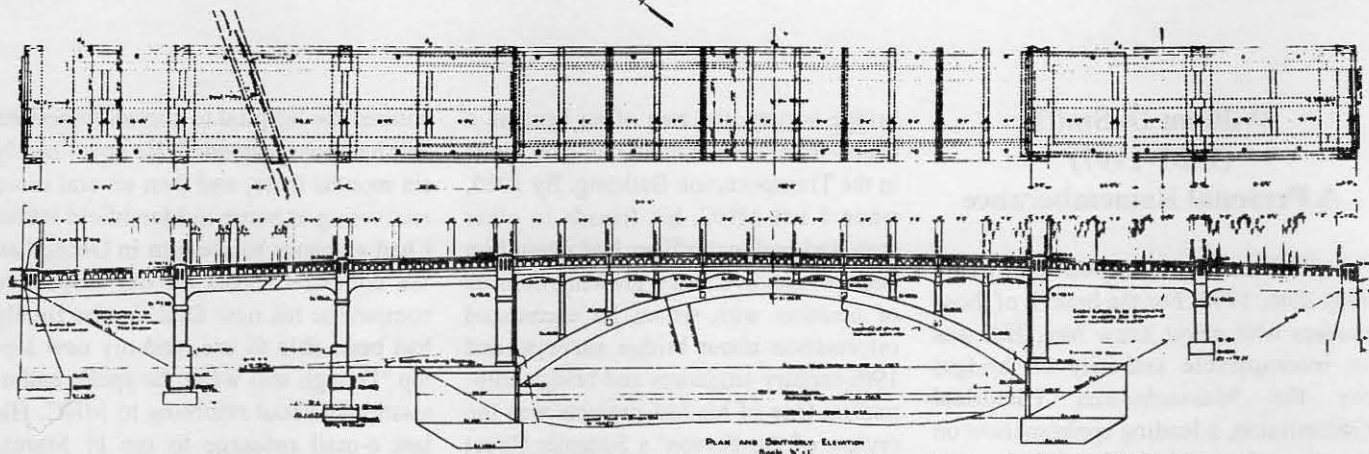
Plan and profile from the original drawing of the Kellyville bridge as it was built in 1933. Print courtesy of the New Hampshire Department of Transportation.
